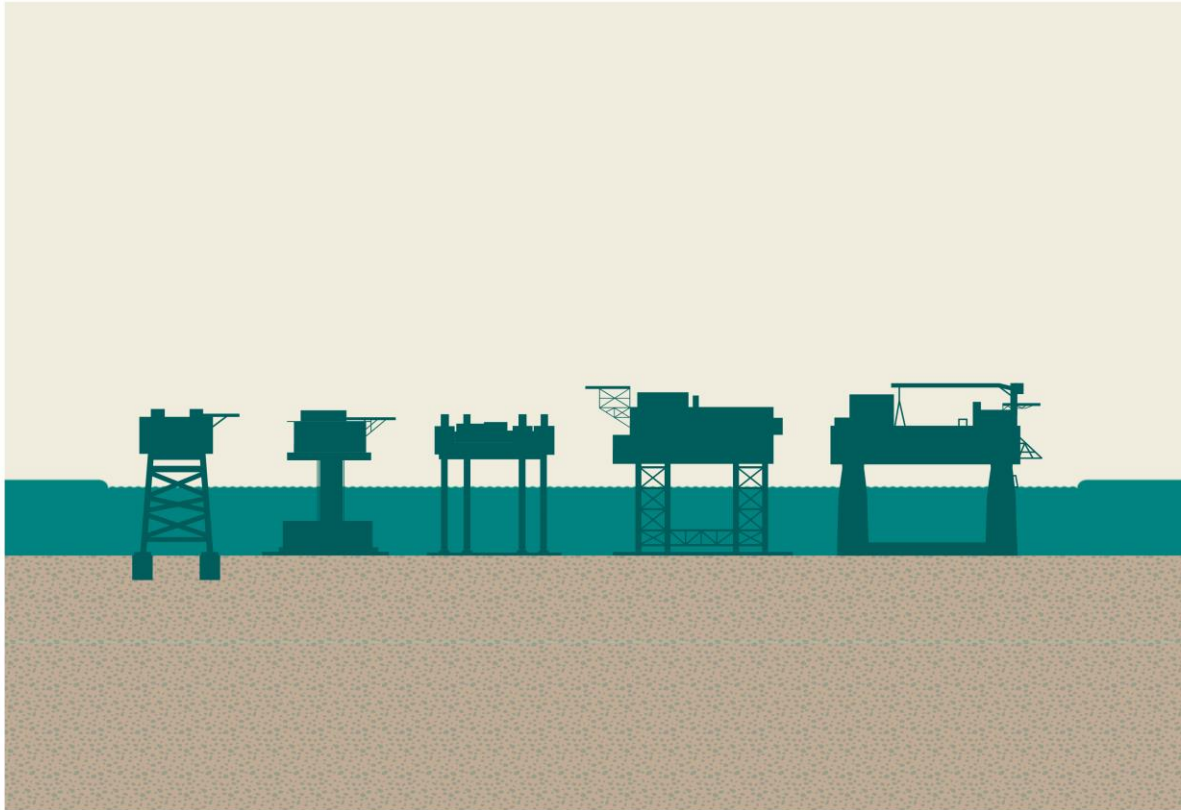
Examples of offshore transformer/inverter stations/hydrogen stations and their foundations. From the left: jacket foundation, gravity foundation, support leg foundation, jacket foundation (with float-over installation), self-installing gravity foundation.
